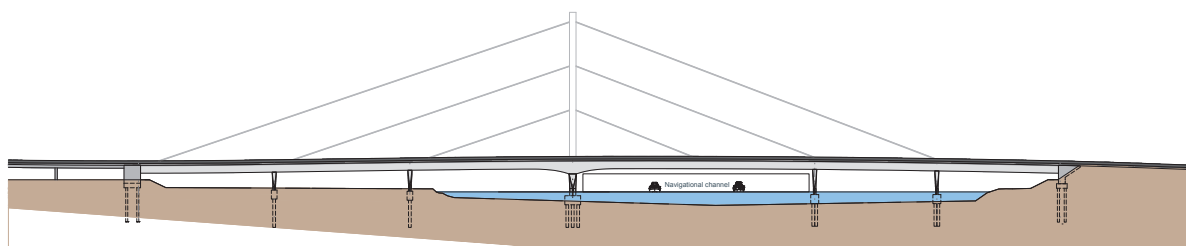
Side view of the Voest bridge including the designed bypass bridges with the haunch placed directly below the main pier and the two additional pillars (FCP, 2014)
